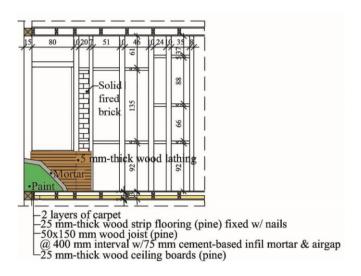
Elevation of Semi-Repaired-Wall 3 & section of Semi-Repaired-Floor 2 in 1/50 scale (Drawn by author).
